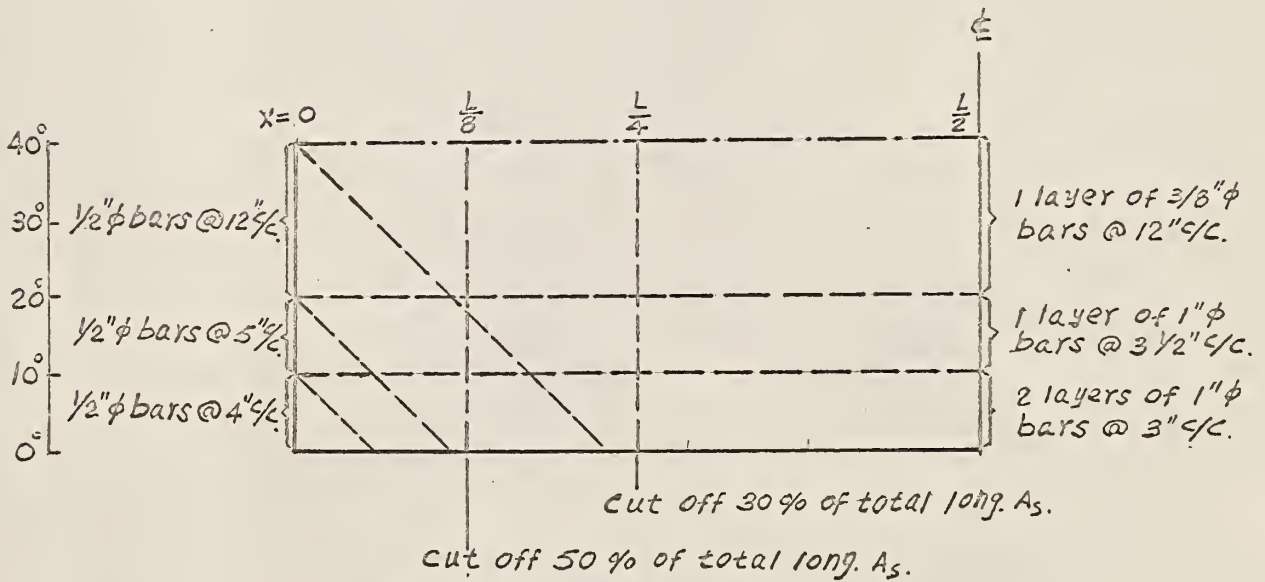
Arrangement of longitudinal and diagonal reinforcement.
